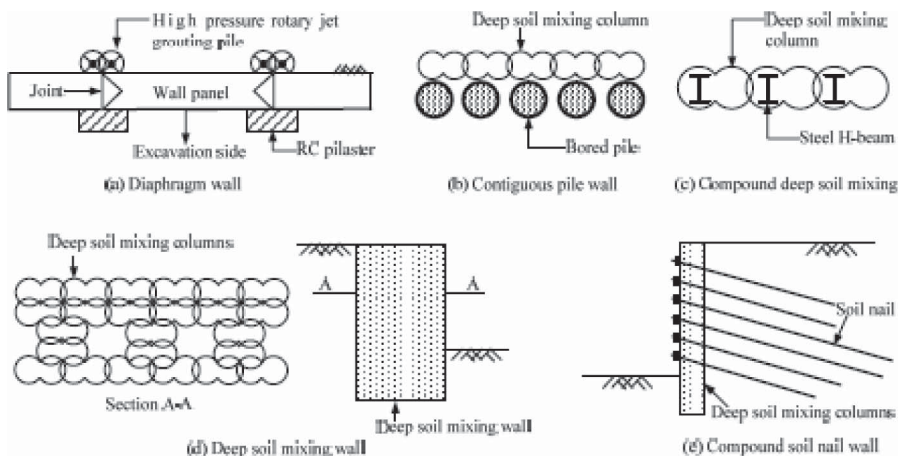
Sketches showing some typical retaining wall types used in Shanghai (from Wang and Xu).
